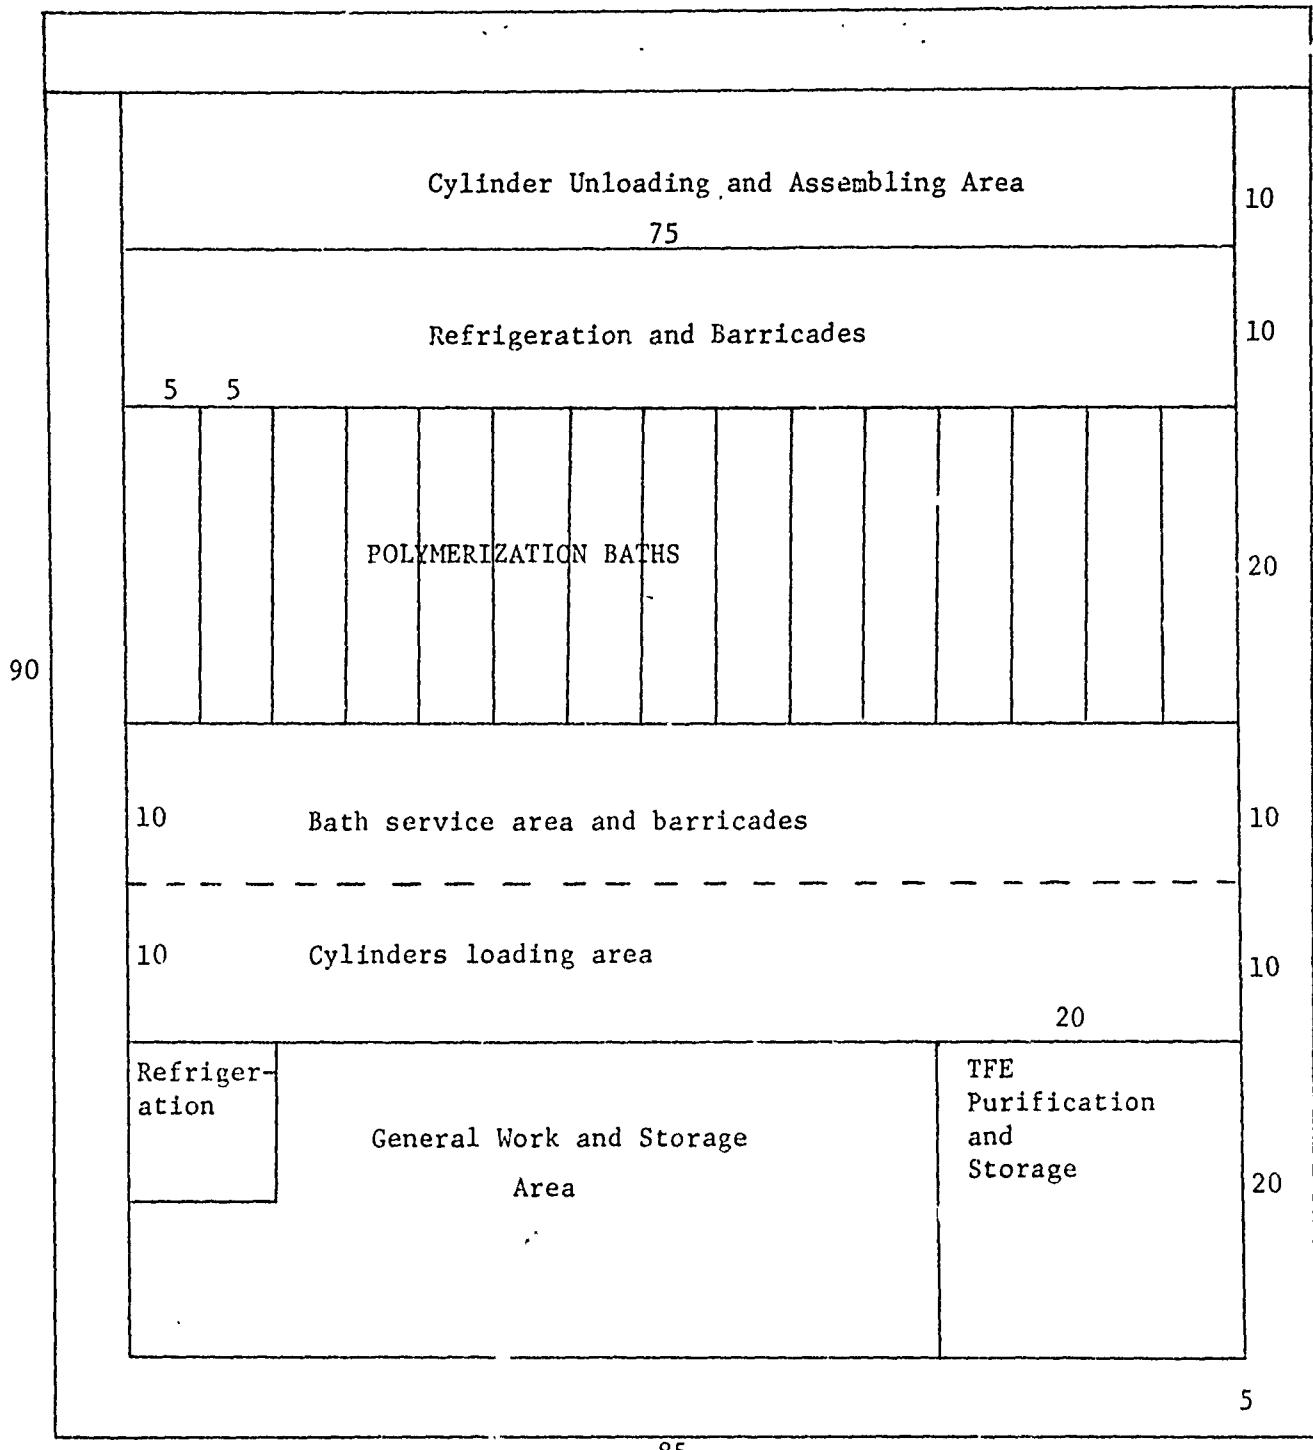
POLYMERIZATION BUILDING FLOOR PLAN
